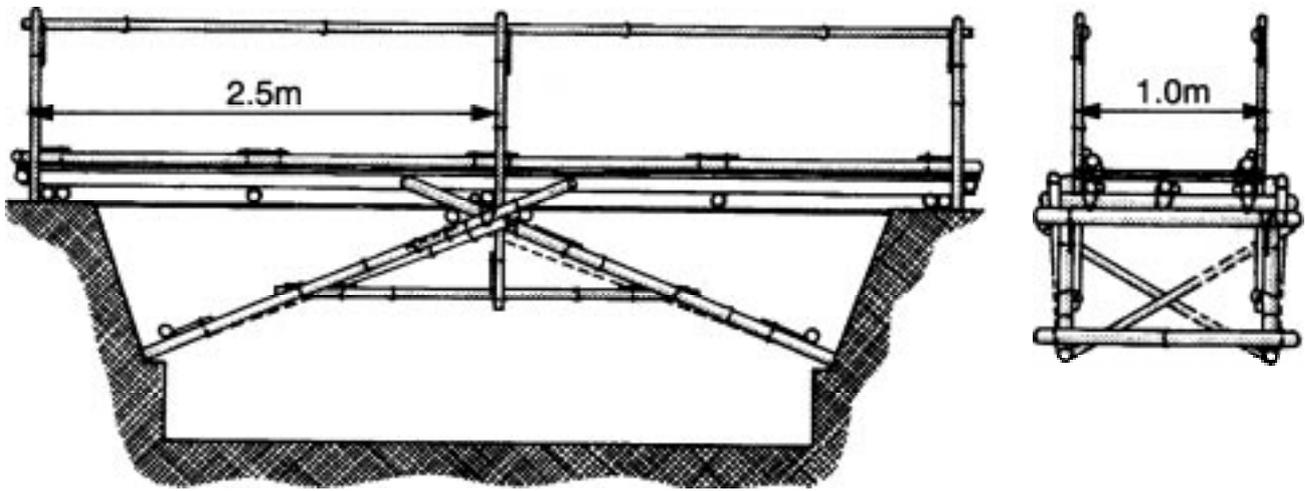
Simple truss (flying buttressed) bridge (after Janssen/Trojani, 1982)
